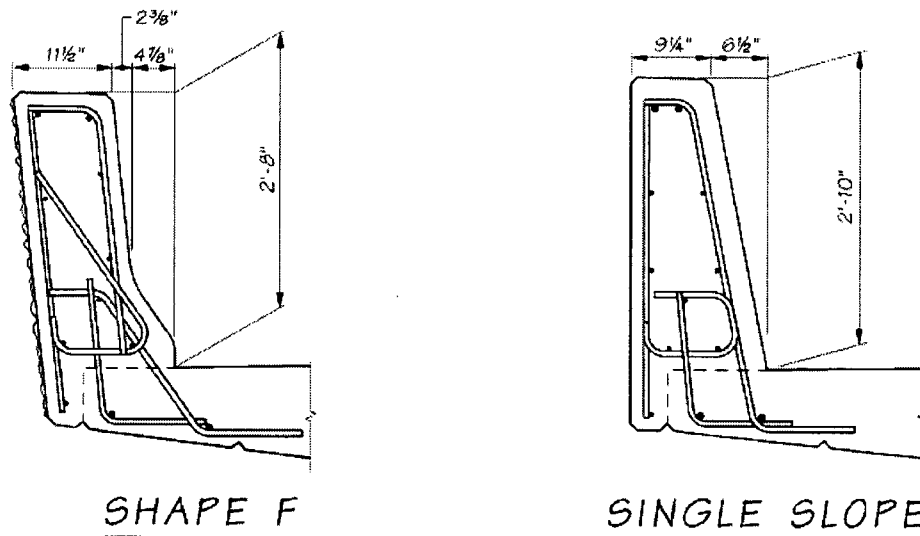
Sample Standard Concrete Barriers Commonly Used in Washington State
